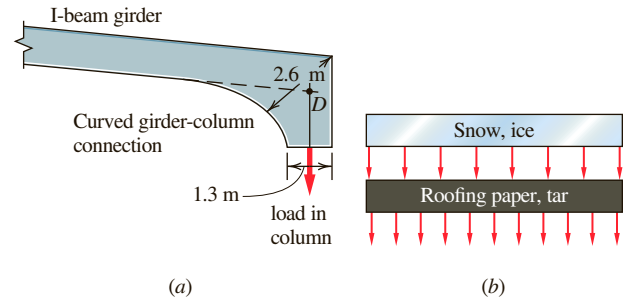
(a) Main girder connects to column; (b) loads on roof.
